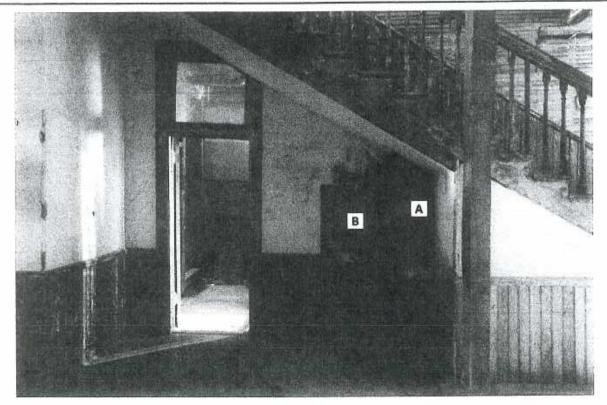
Basement Stair Hall view north. (A) Telephone Box, (B) Central Fuse Box
